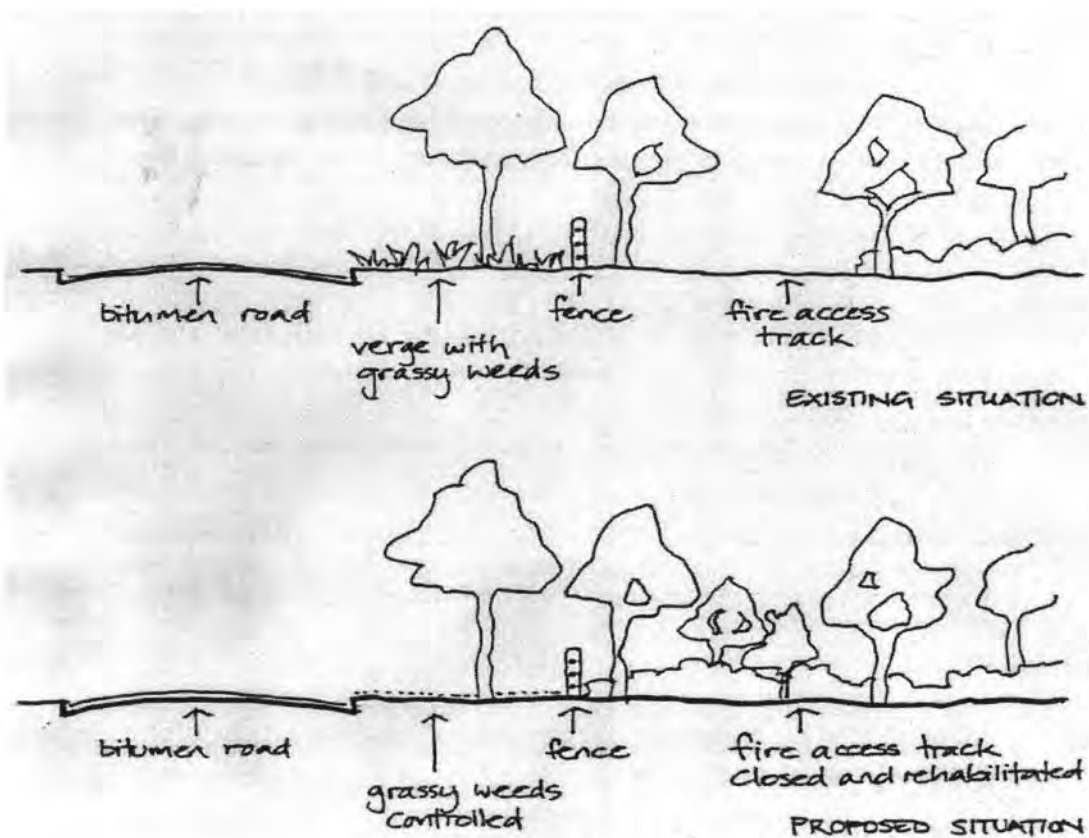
Fire tracks are recommended to be closed and rehabilitated where they are located adjacent to bitumen roads and where the road verge is maintained with a low fuel load
